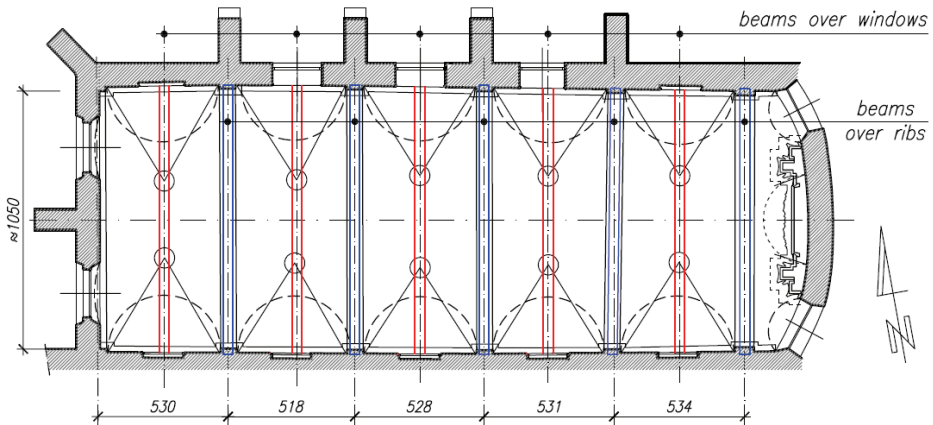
St. Barbara's church. Plan of barrel vault with cable system stabilizing lateral walls.
